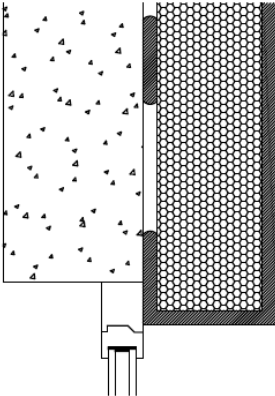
Window mounted within the wall on which the façade system is mounted.
